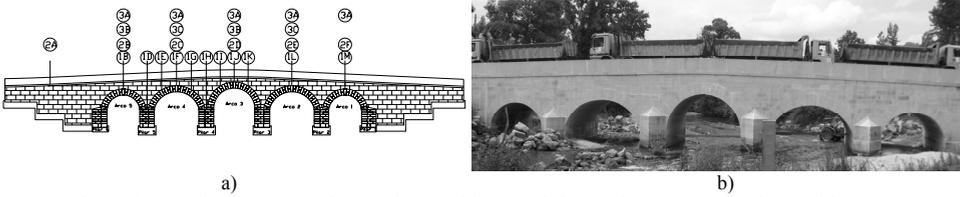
Load test. (a) Truck stopping positions and (b) truck arrangement for position 3A.
